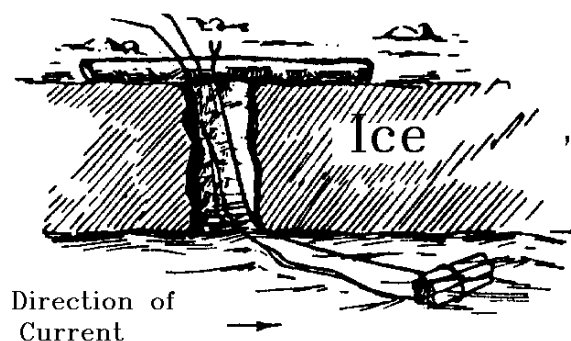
"Drilled Holes With Explosives Under the Ice for Ice Blasting".
